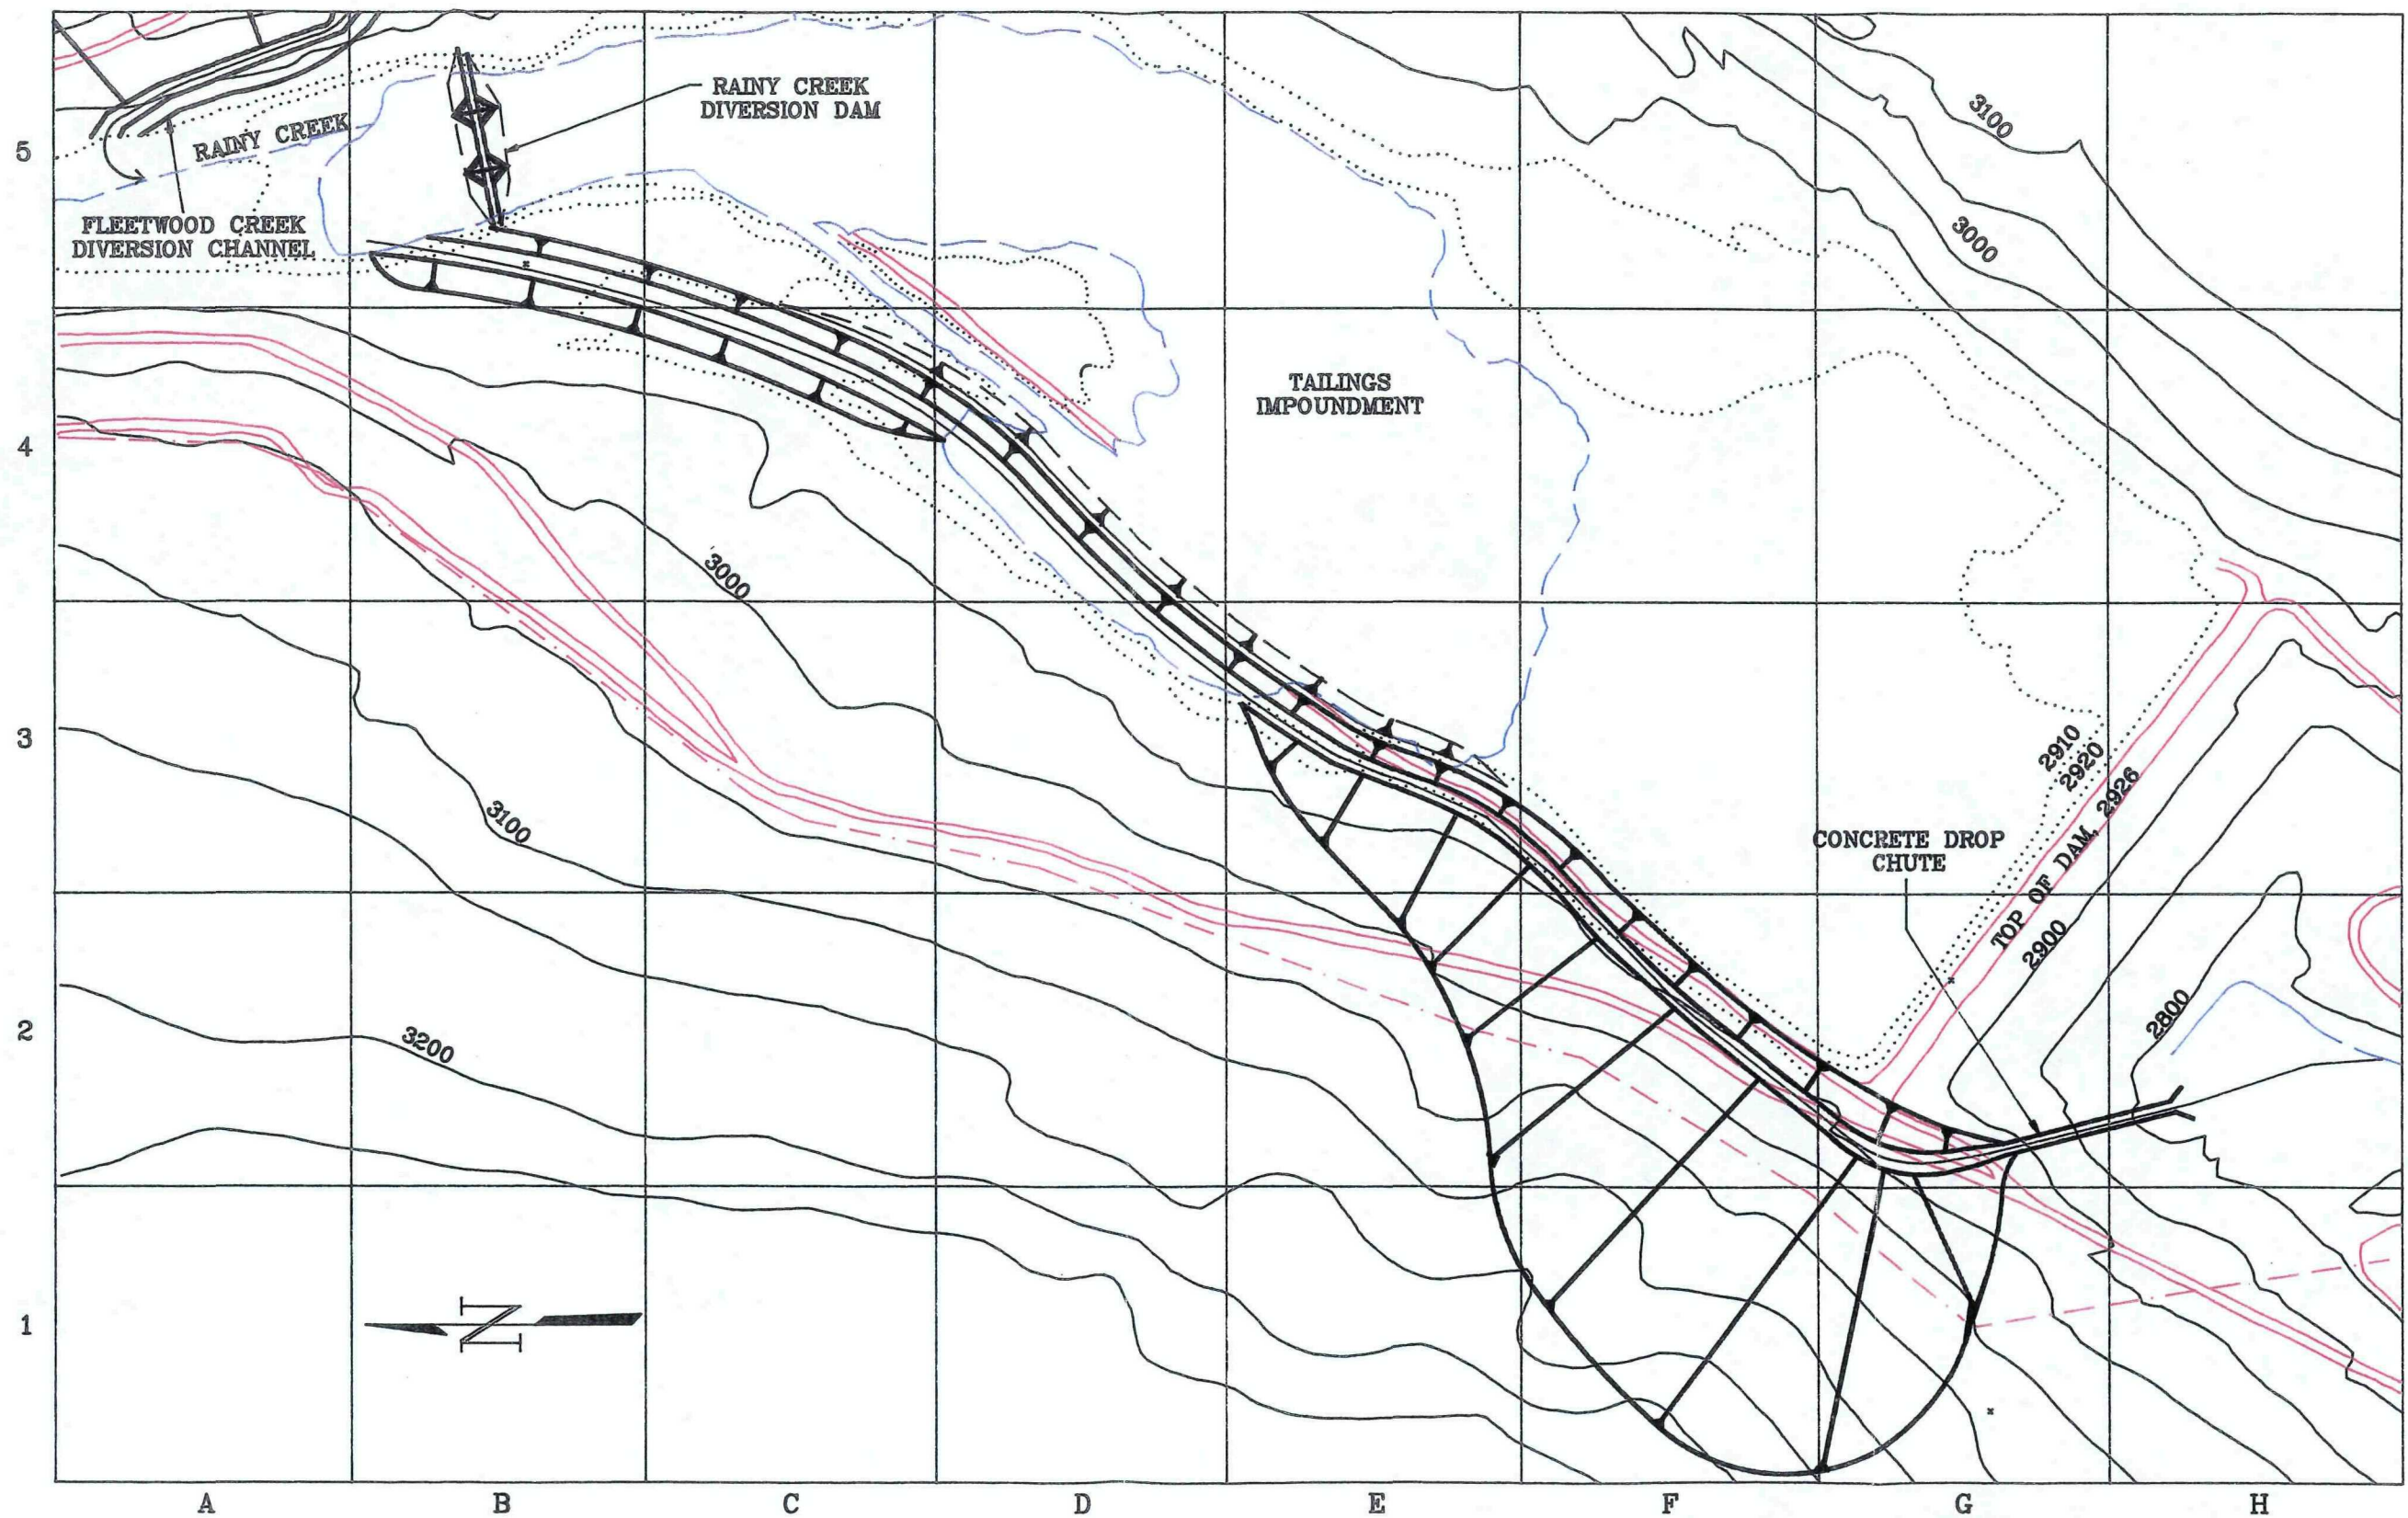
A. Plan view of full diversion dam and channel to deliver Fleetwood Creek to the Rainy Creek diversion dam. Diversion dam located above coarse tailings dump. This figure to be matched with Plate 4-B.
